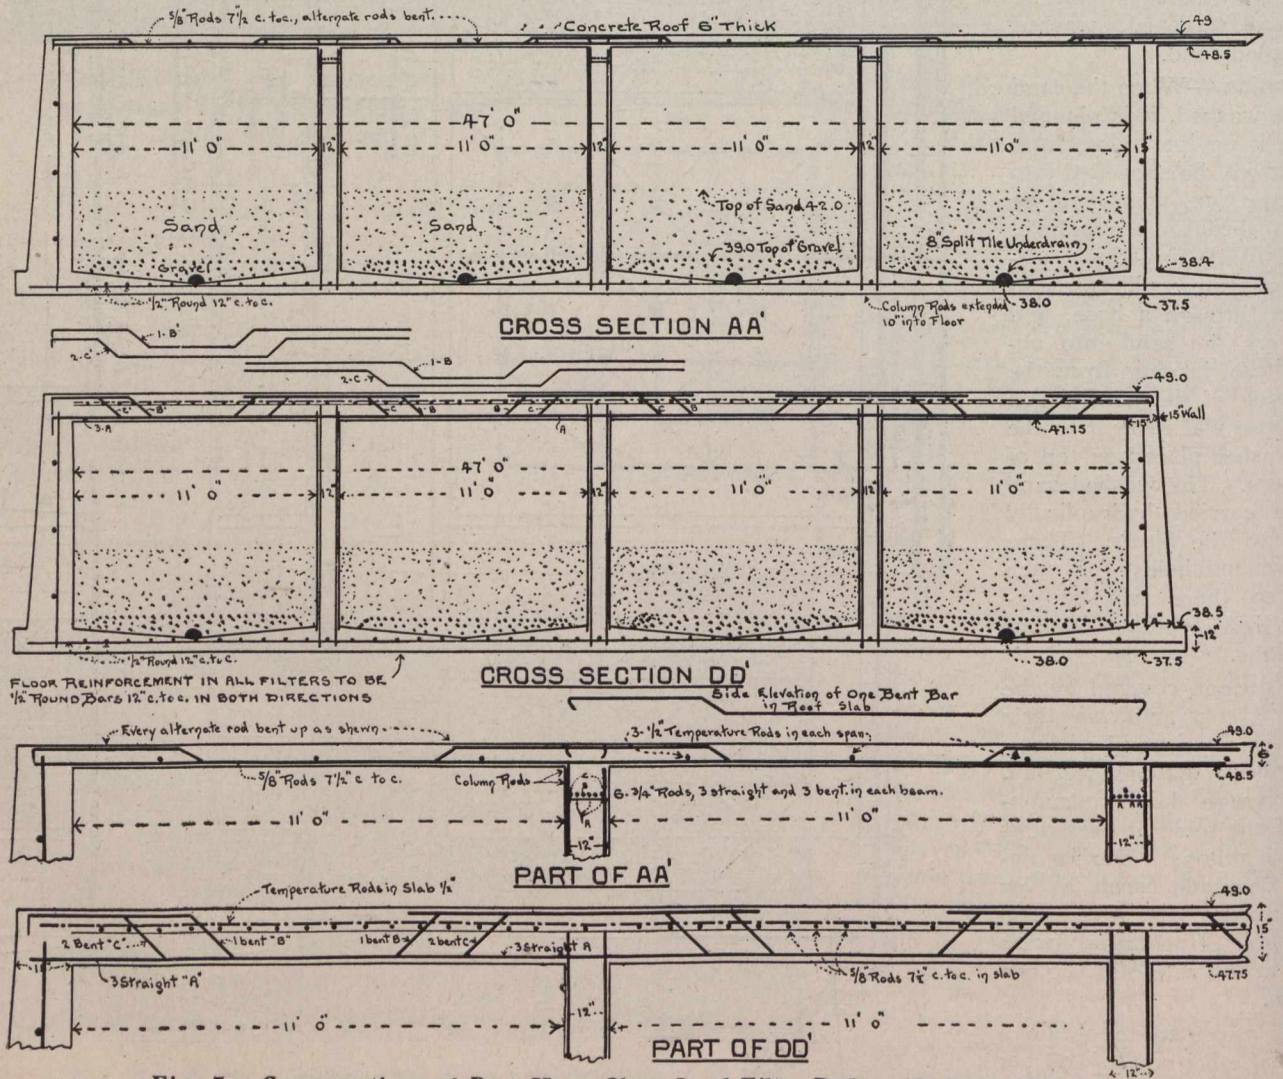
Cross-sections of Port Hope Slow Sand Filter Beds. (Refer to Fig. 5.)
